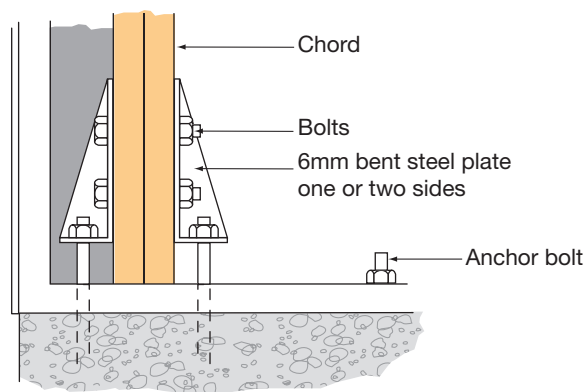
Some methods of connecting the end of a wall to the foundation
